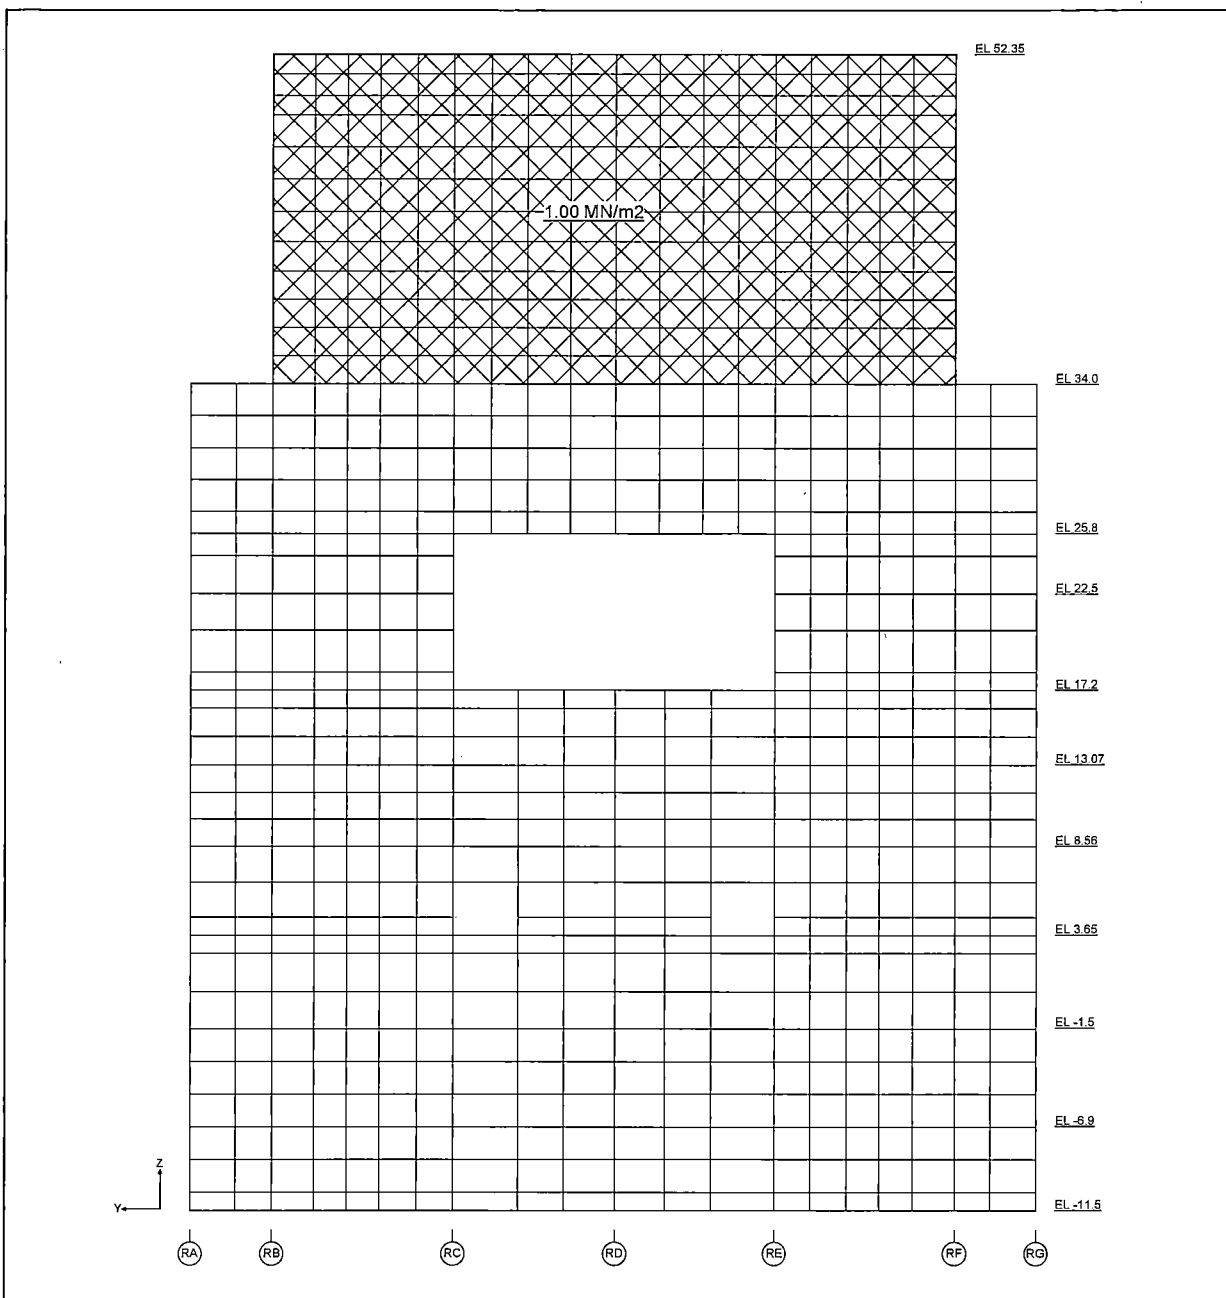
HELB Pressure Load (for RB General Rooms: R1 Wall)
